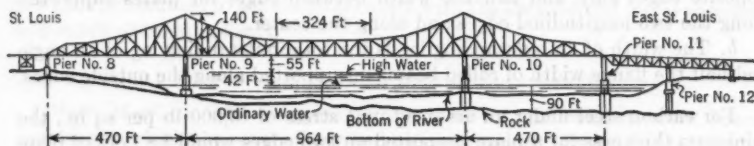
ELEVATION OF EAST ST. LOUIS (ILL.) VETERANS MEMORIAL BRIDGE
